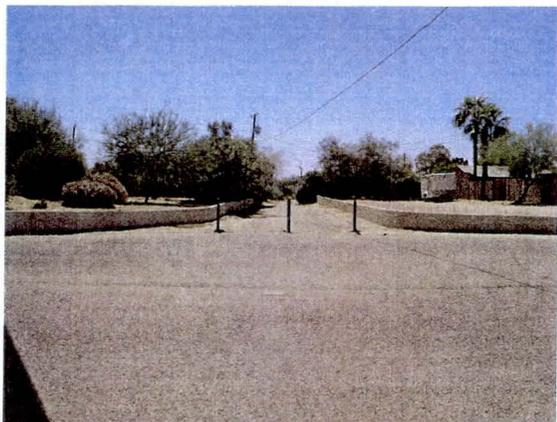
Drainageway south of Sunnyside Drive (Facing South)
